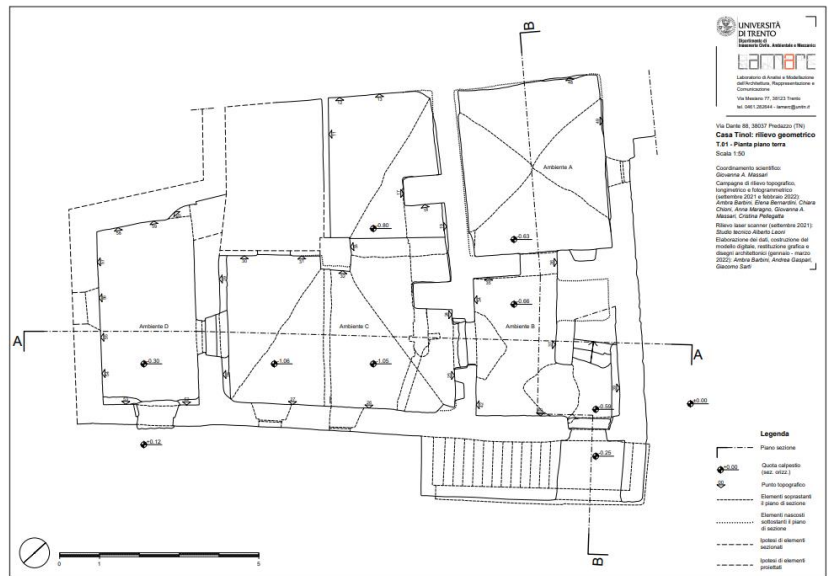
Horizontal section drawings from the 3D model via sections. Elaboration by LAMARC.
